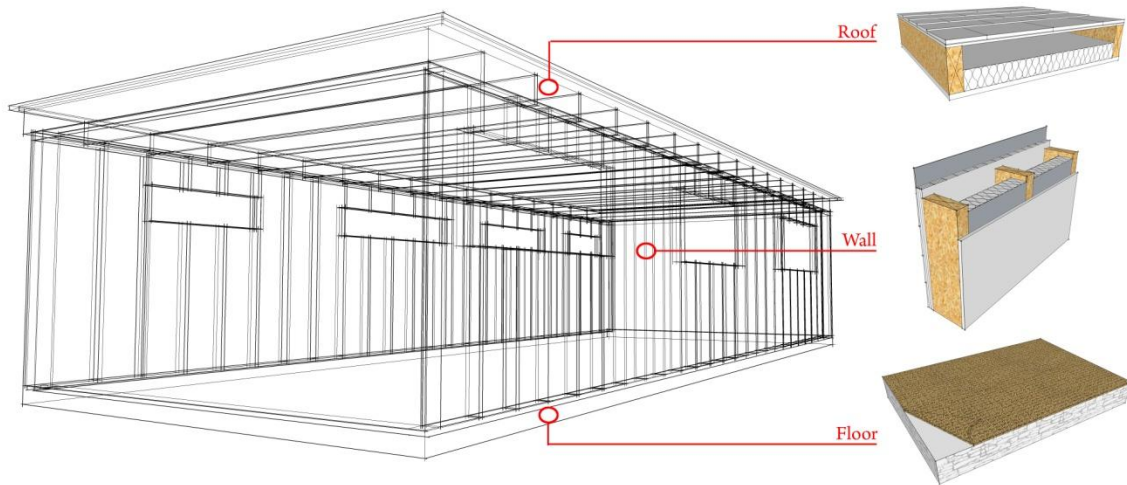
The wall, roof and floor construction as per the ASHRAE 90.1 standard.
